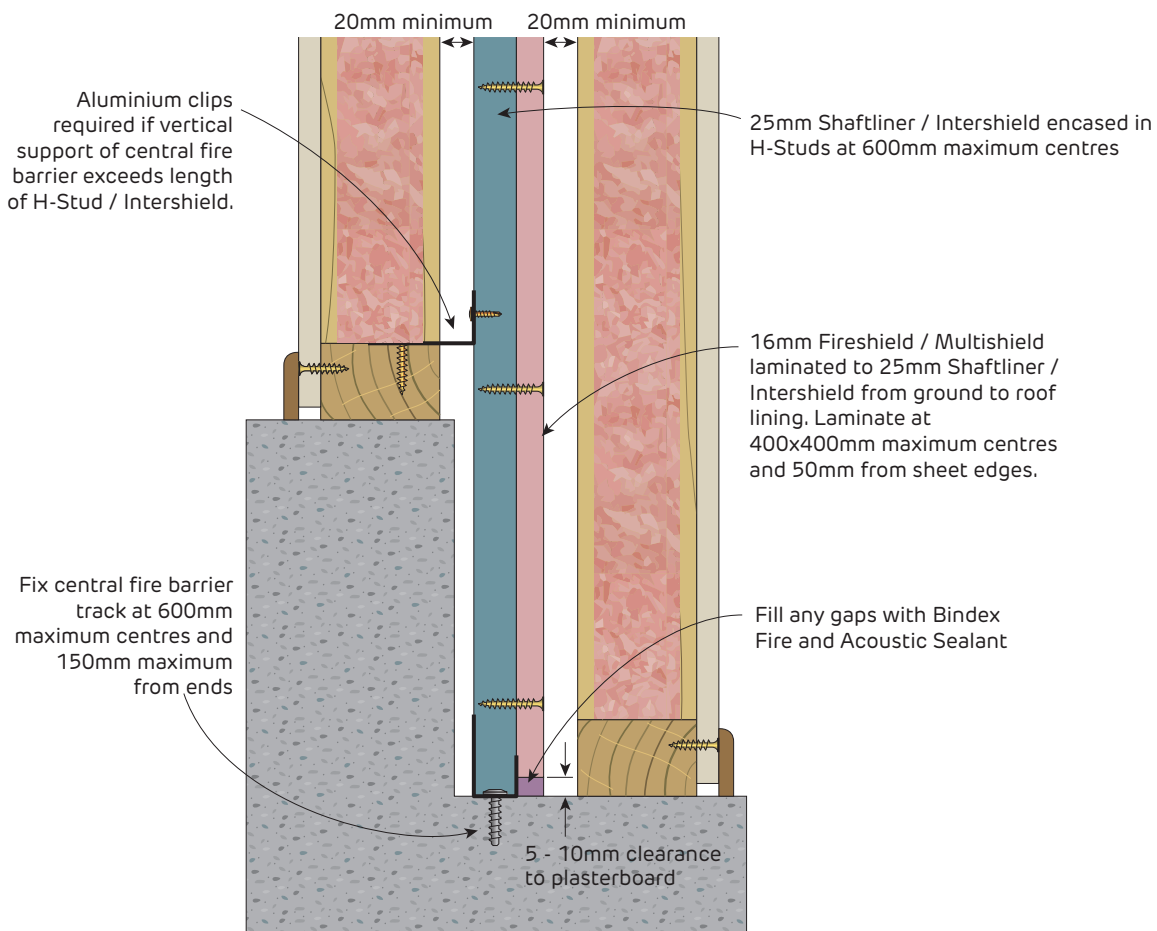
Interhome Wall Base to Slab with Larger Step-Down
